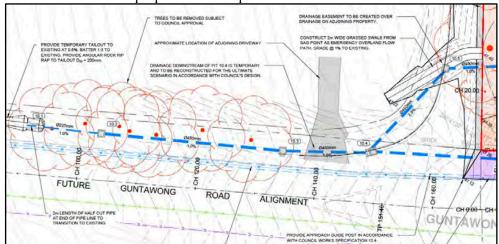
The general arrangement plan can be observed. (Source: Complete Plan set, by TTW Rev 4 Dated 22/1/2025)
